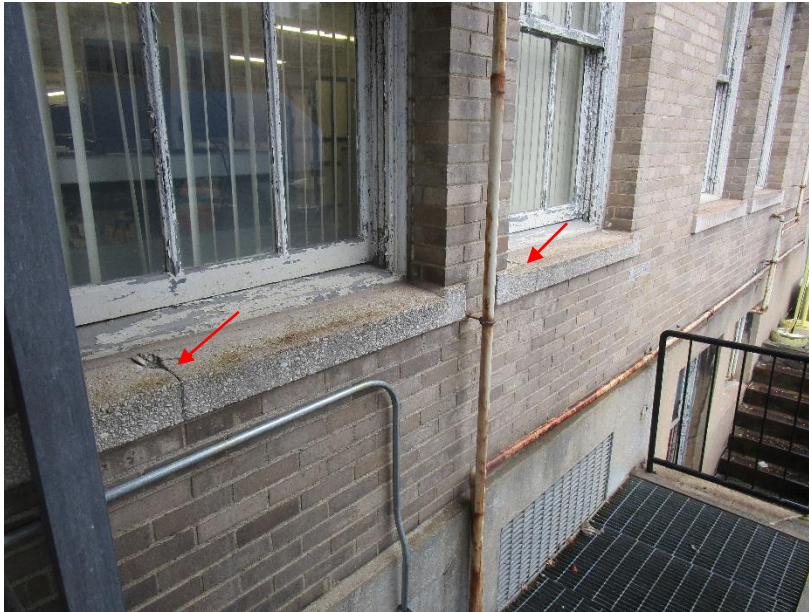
Cracks at cast stone window sills. Also note peeling paint at windows. This paint failure is typical at all windows.
